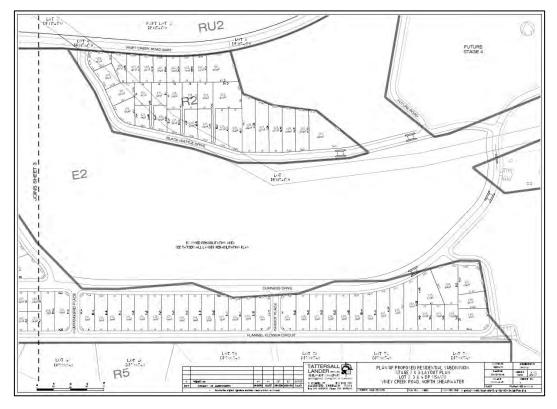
Tattersall Lander Plan Stages Two and Three planned subdivision
